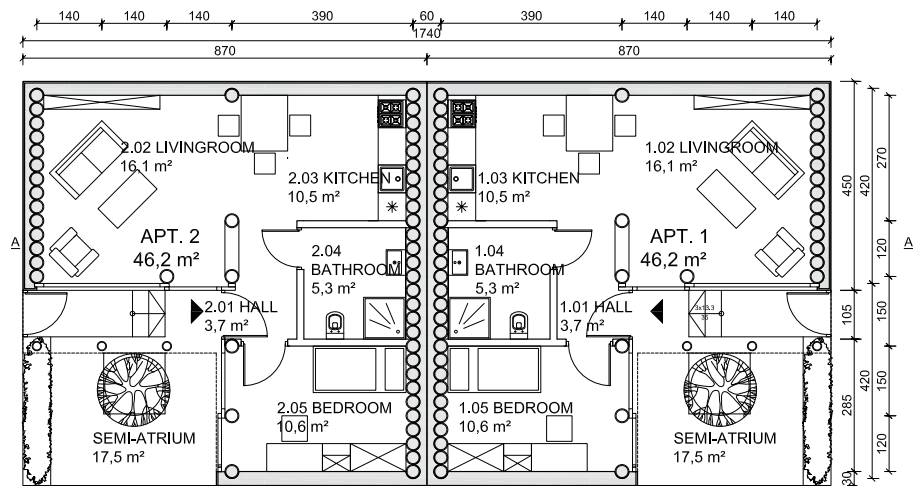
Houses for elderly people: cardboard segment, floor plan, 2012
